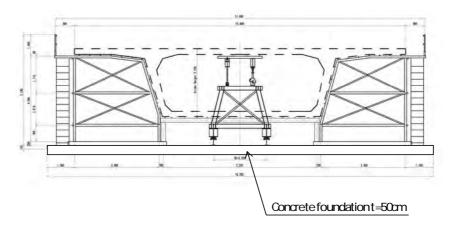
Foundation of Reinforcement assembly stand
